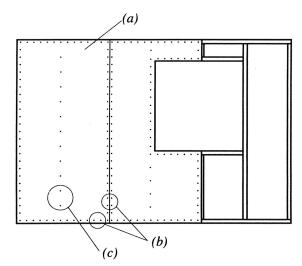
Wind bracing with sheet material (NBI Building Details A523.251).
